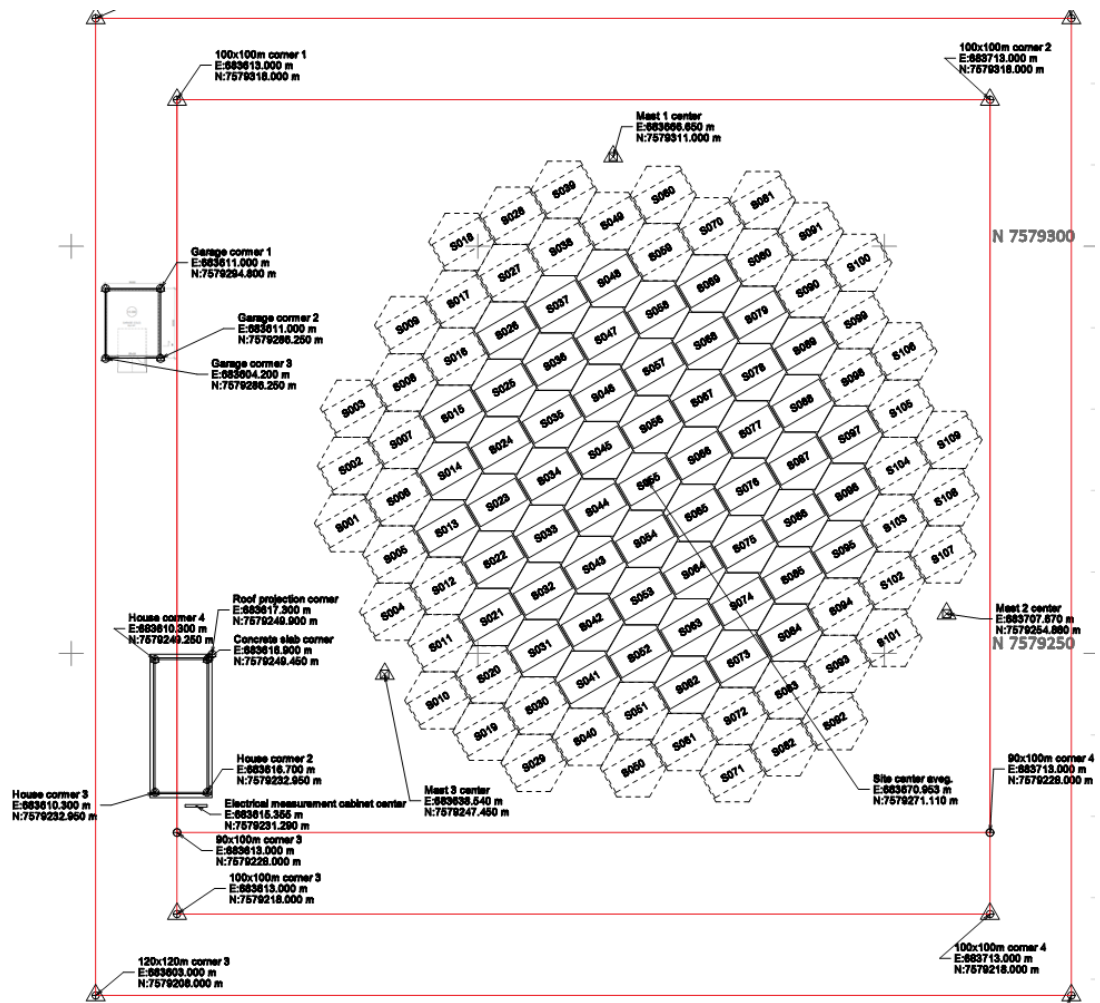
Illustrative Layout of Kaiseniemi Site
